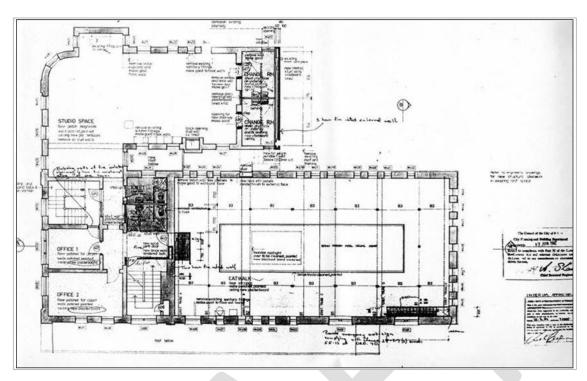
1982 Second Floor plan, showing the existing gallery and former sailors accommodation in the original 1860s wing and proposed studio space and change rooms in the northern, 1920s wing and which replaced the former Superintendent's quarters. (Source: City of Sydney Archives 539/1/82)
